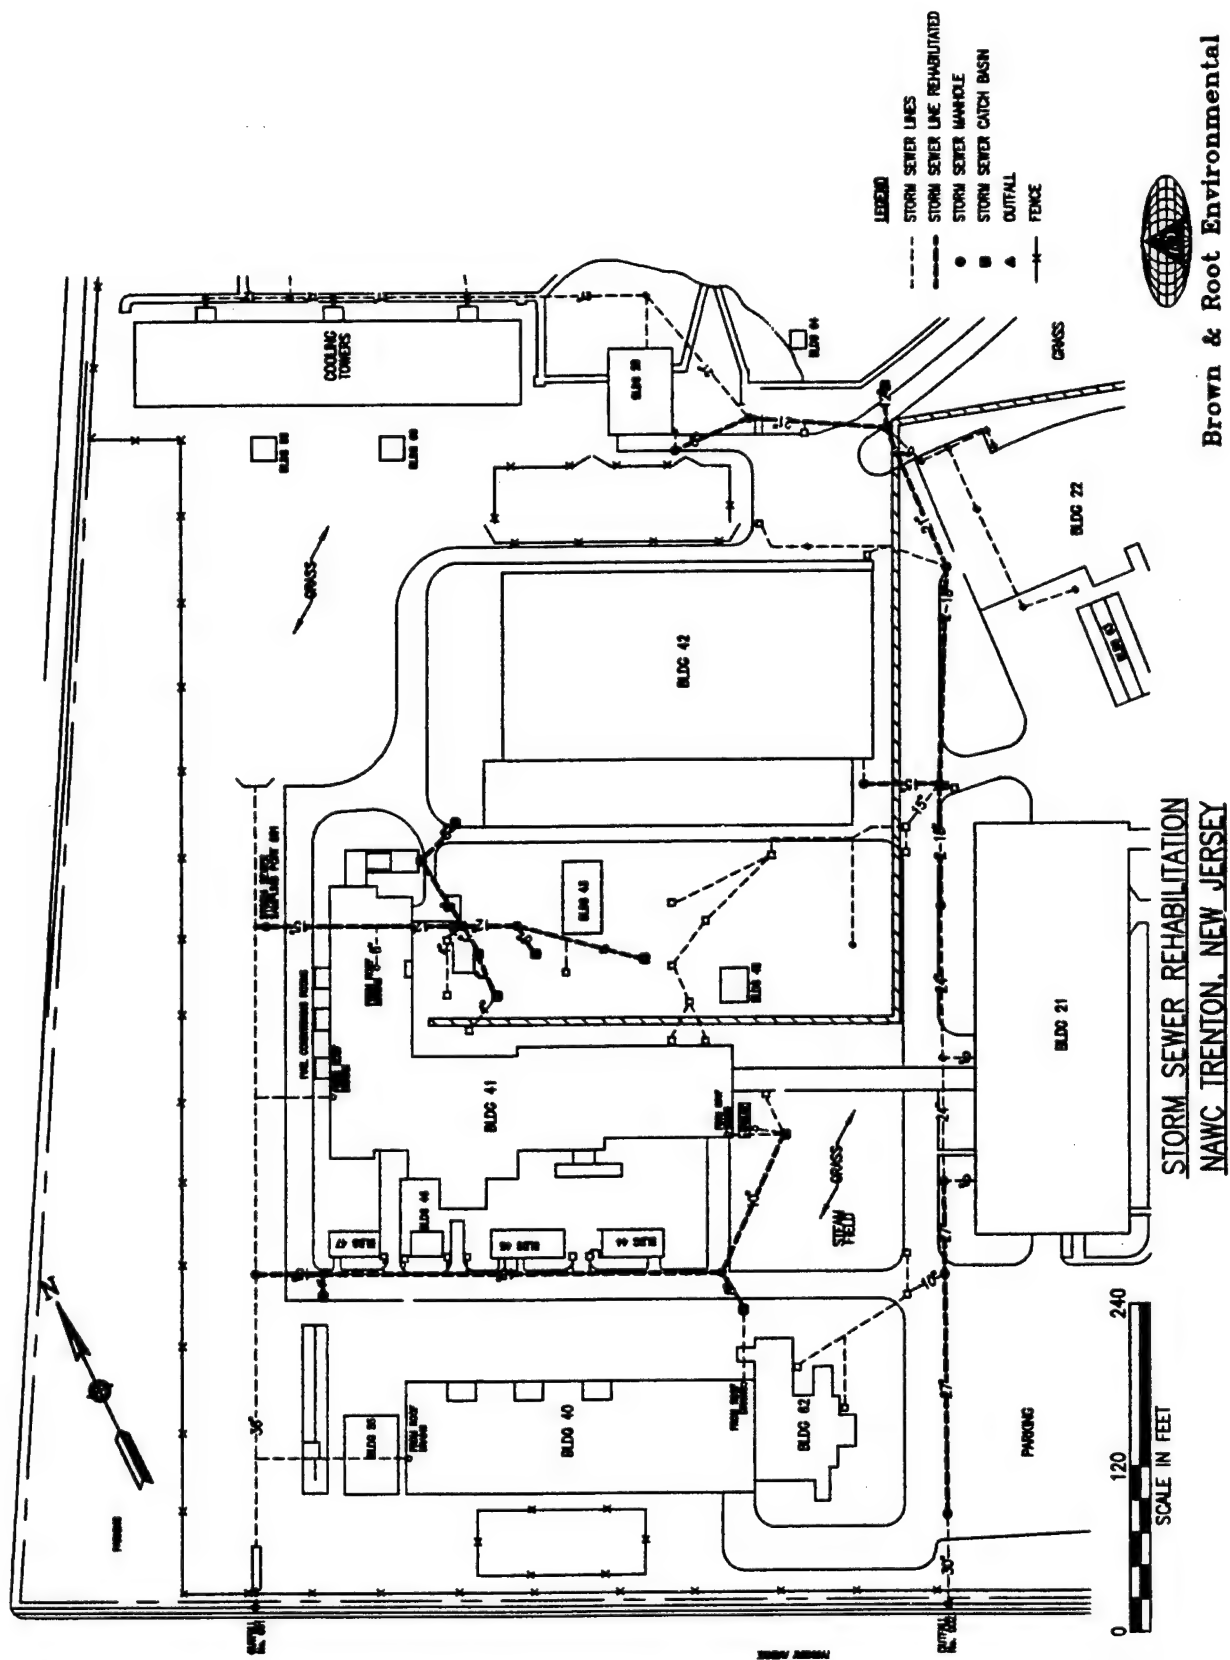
Site Plan of Outfalls 001 and 002 Storm Drainage Area - NAWC Trenton.
